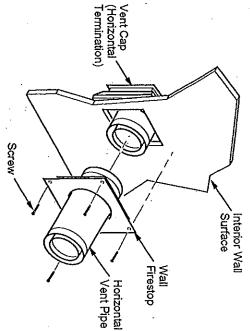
Connecting Vent Cap with Horizontal Vent Pipe
